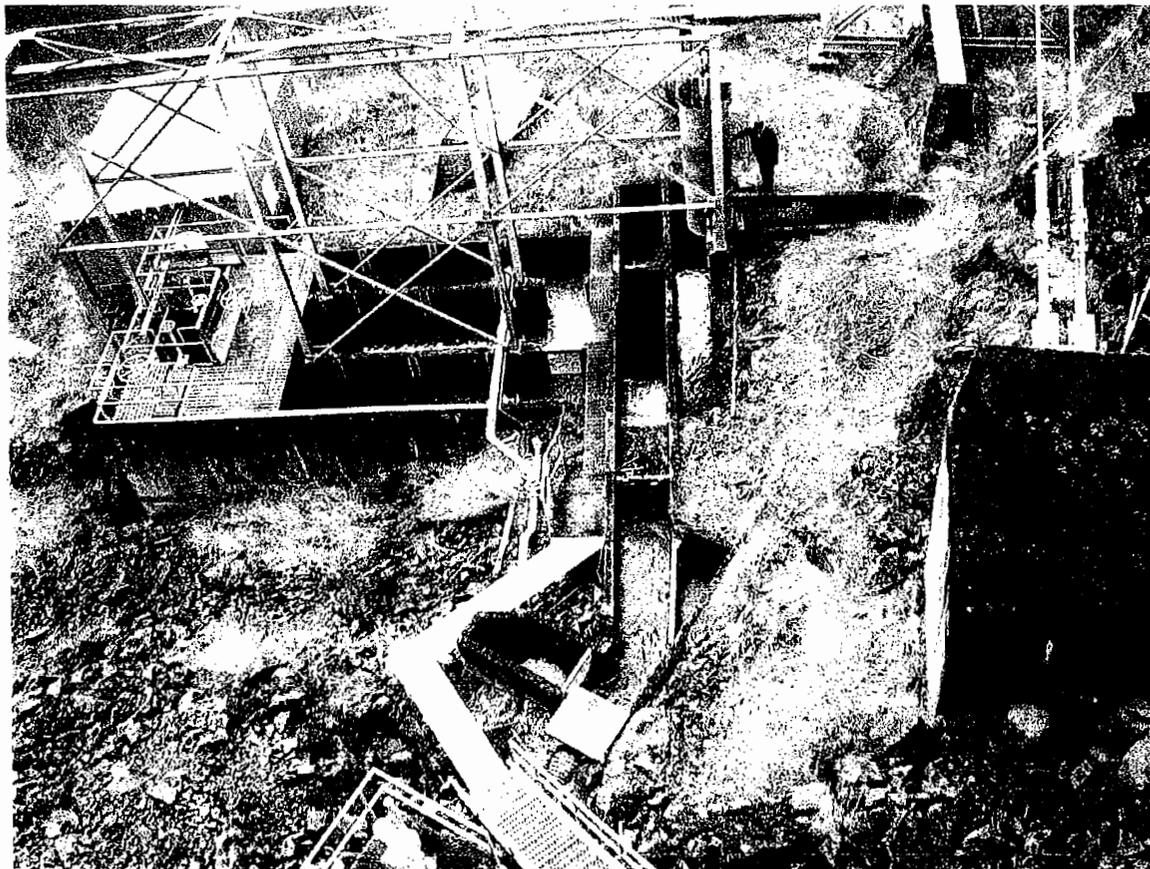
Smolt Monitoring Station on D/S North Abutment
